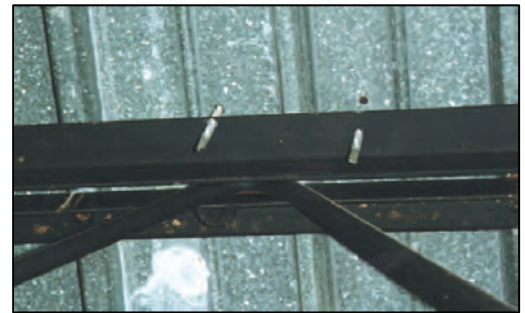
Improperly and properly installed screw anchors into existing joist's chord.
